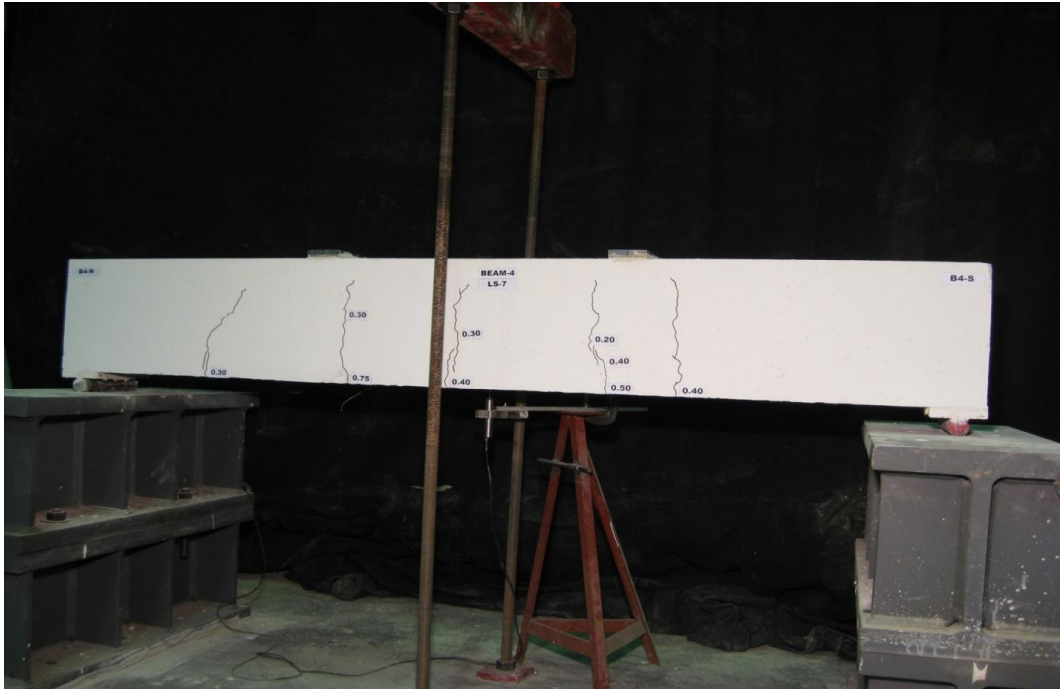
Cracking pattern for beam 4 at a load of 56.02 kN (B4-LS7)
